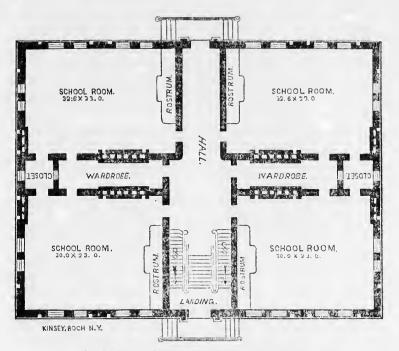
Ground Plan and First Floor, adapted to Fig. 148
